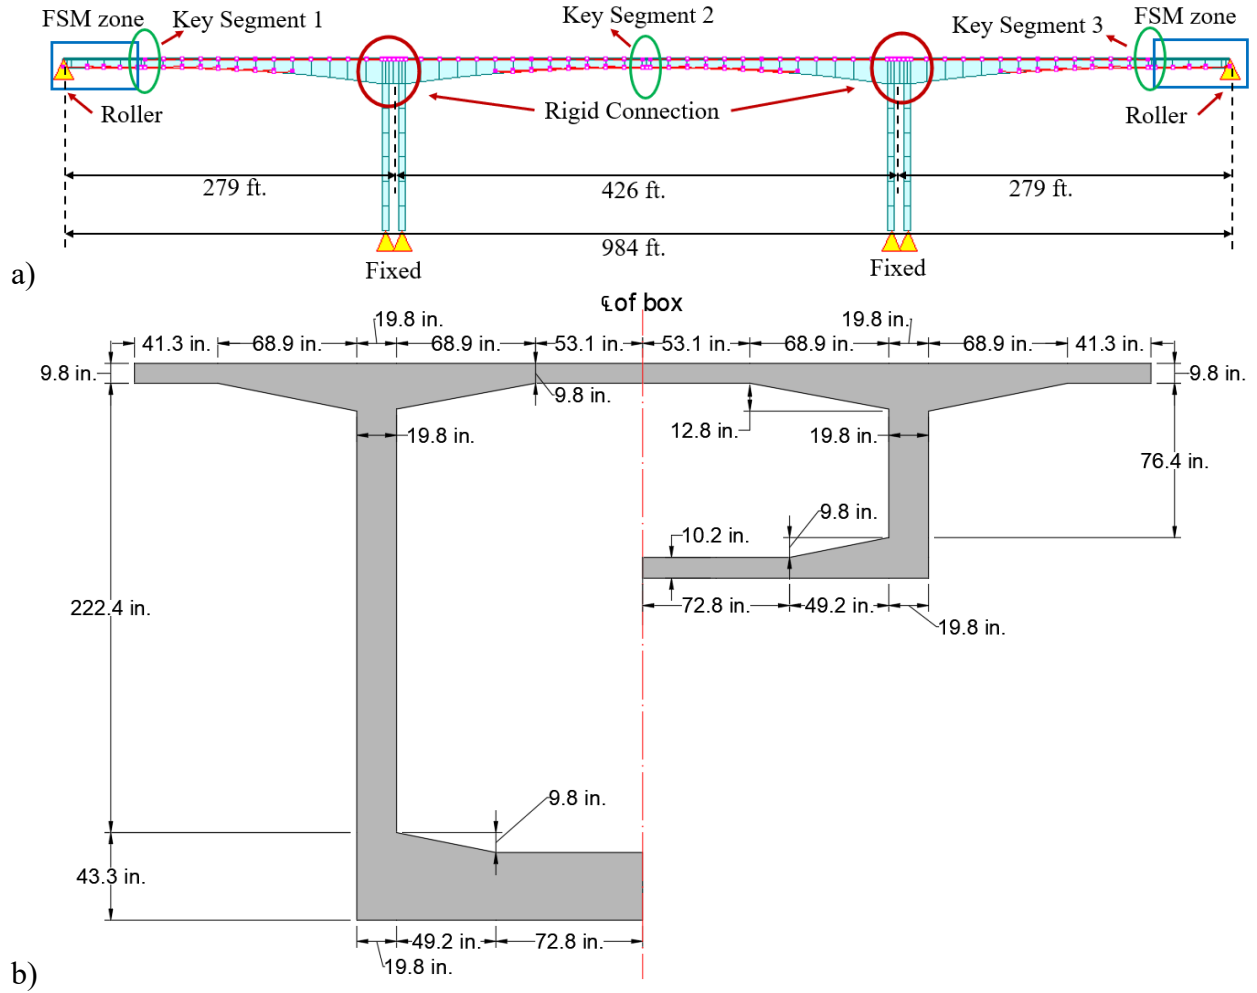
a) Elevation and b) Cross-Sectional Views of the Concrete Segmental Bridge
